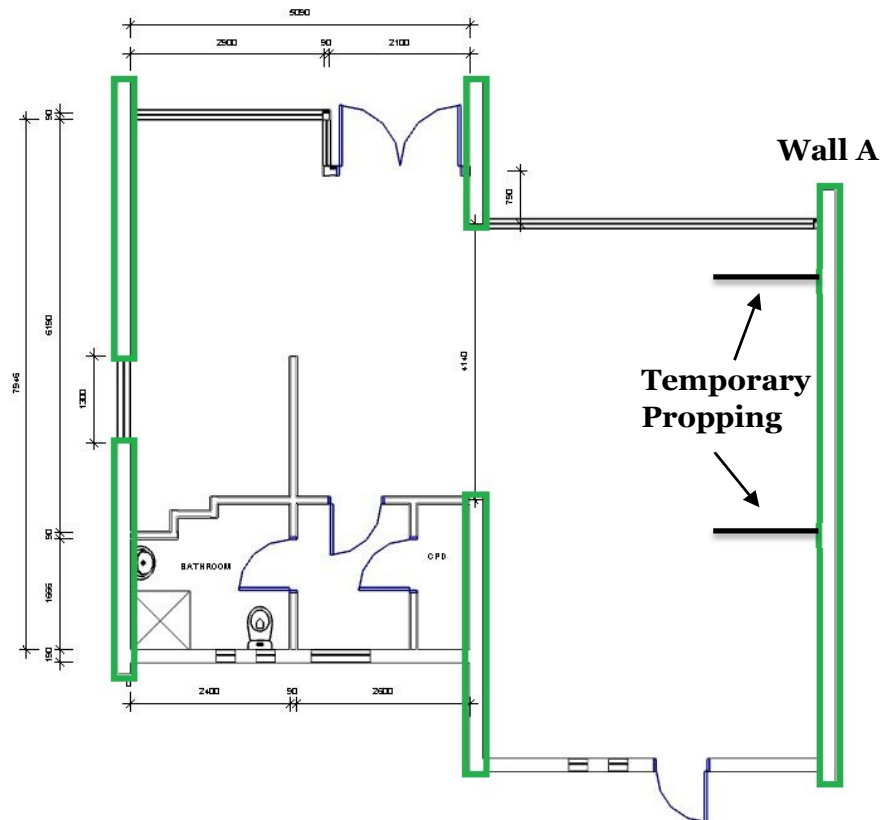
Walls used for bracing in the transverse direction Residents Lounge.
